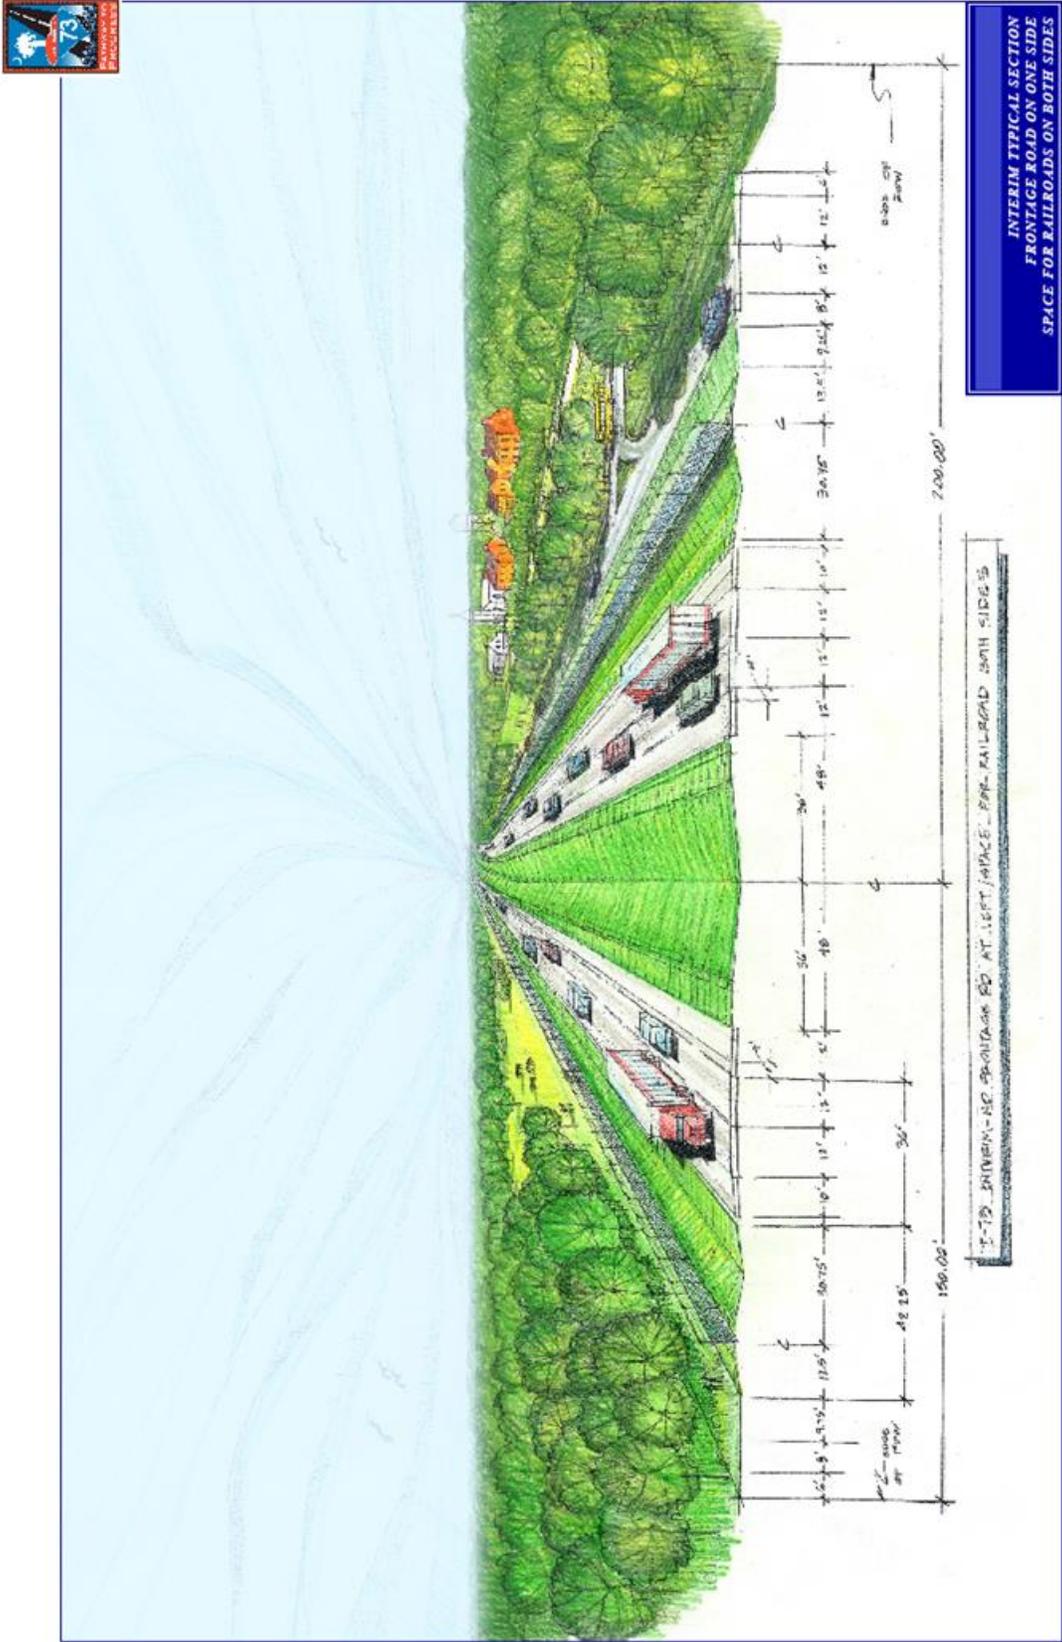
I-73: I-74 to I-95 - Proposed Cross Section
